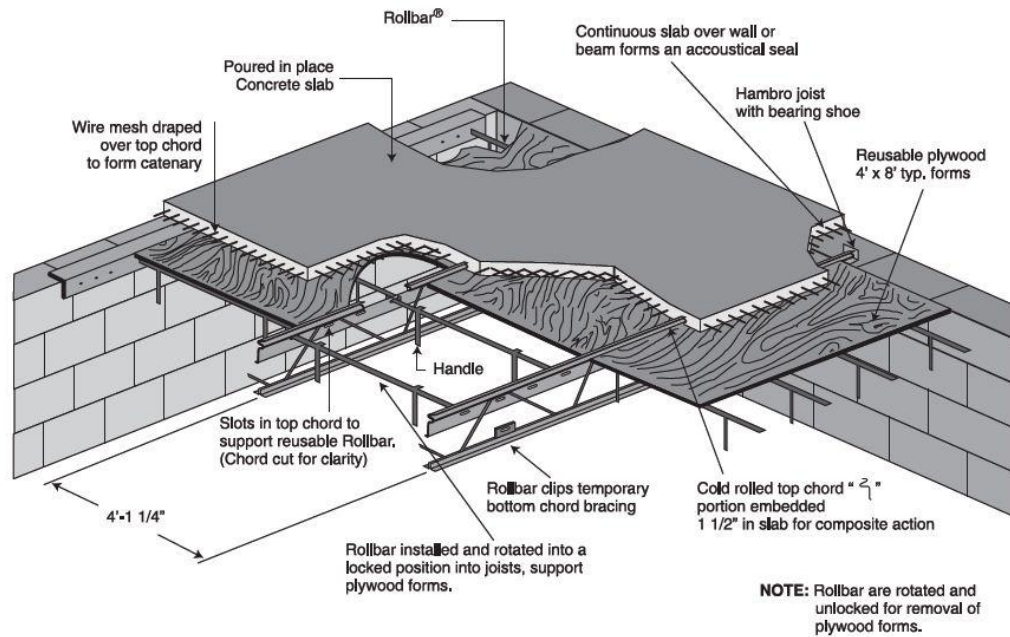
Hambro floor joist system. (Hambro Joist Company).
